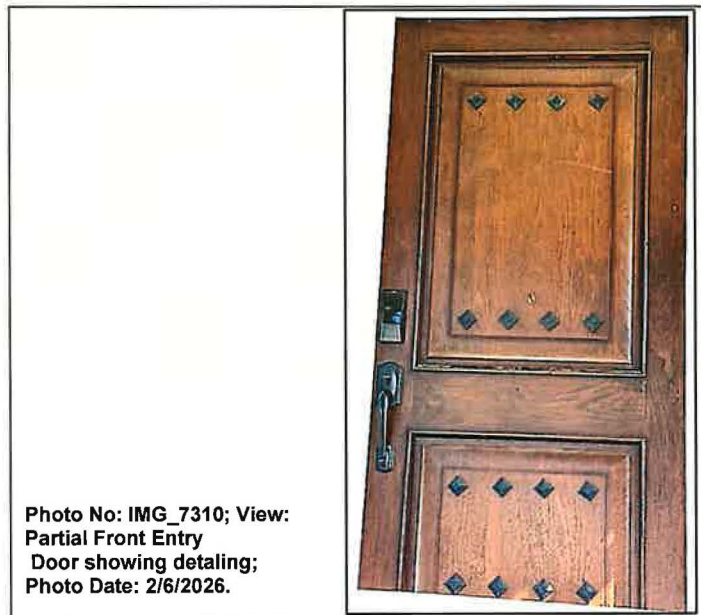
; View: Partial Front Entry Door showing detailing; Photo Date: 2/6/2026.
